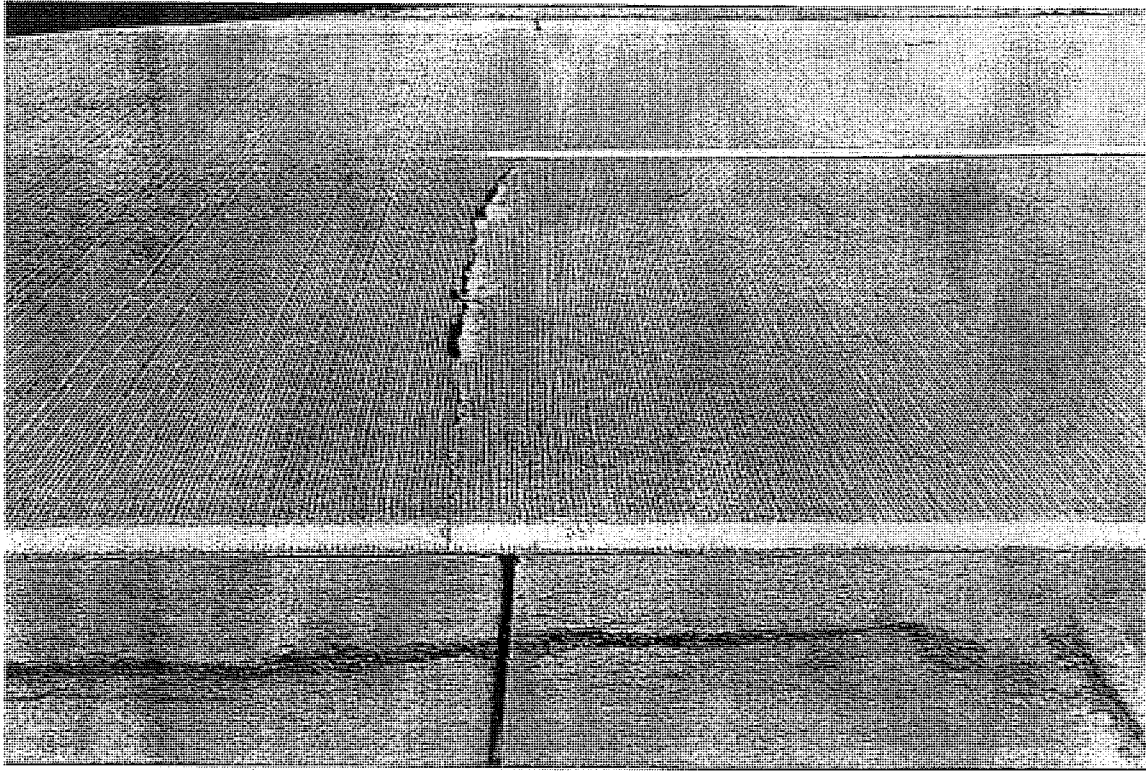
A full width transverse crack on CSN# 44044-18804A WB. The crack is tight in the passing lane and is spalling in the truck lane. This crack, was induced by the intermediate shoulder joint.
